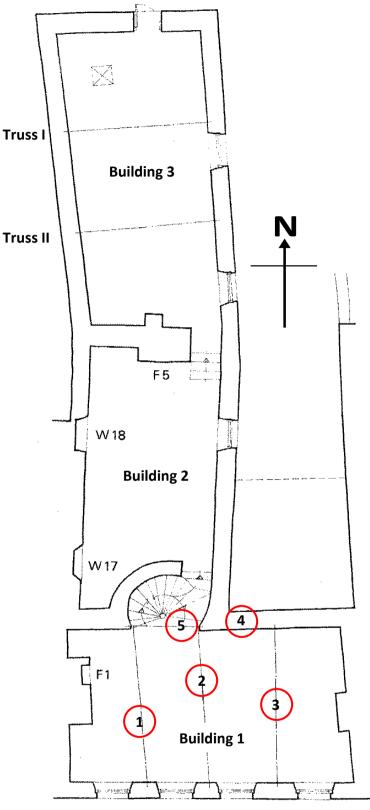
Plan of the Ship Inn at ground floor level to show arrangement of the buildings and the locations of the sampled timbers (see Table 1) (after Phillip Cracknell/Alpha Design)
